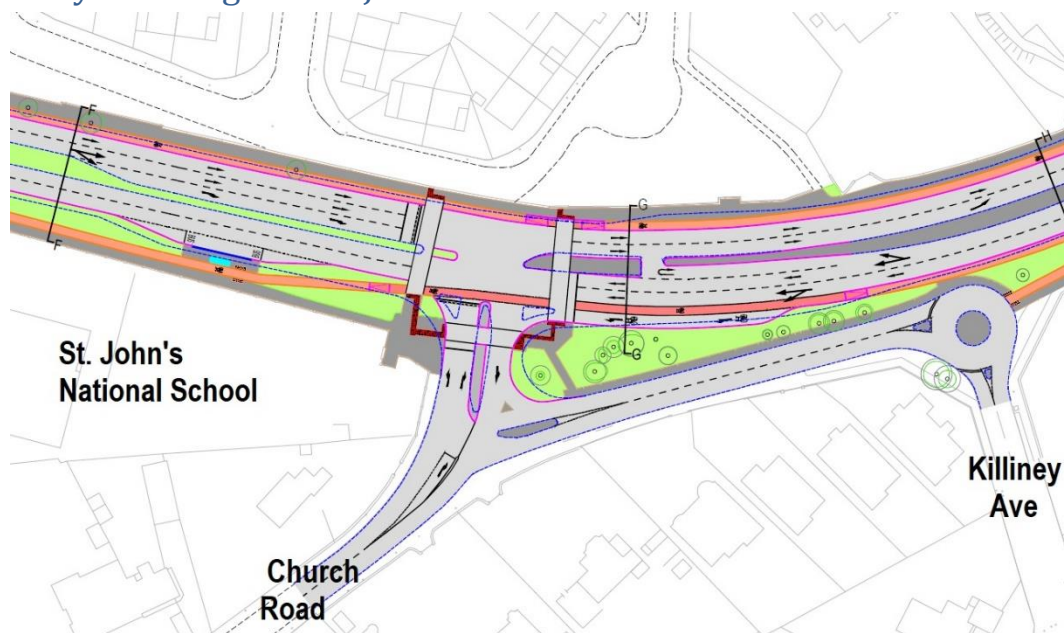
Proposed toucan crossings on all three arms of Church Road Junction.
